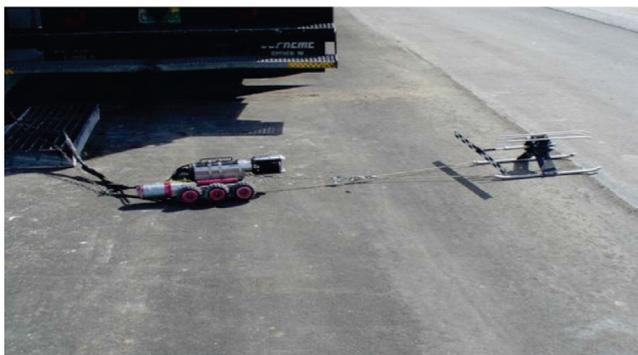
Laser profiler and CCTV used in tandem for pipe inspections.
